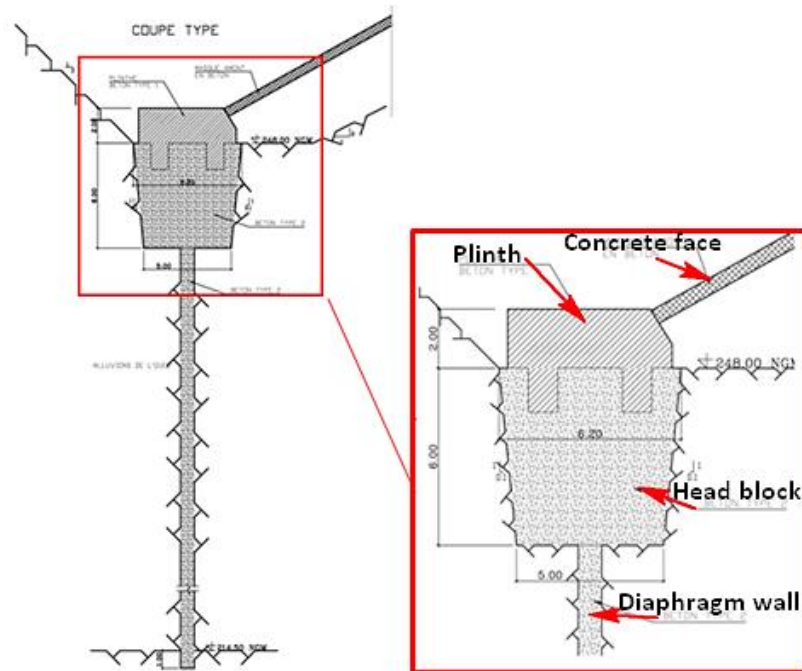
Typical section of the diaphragm wall (adapted from [1])
